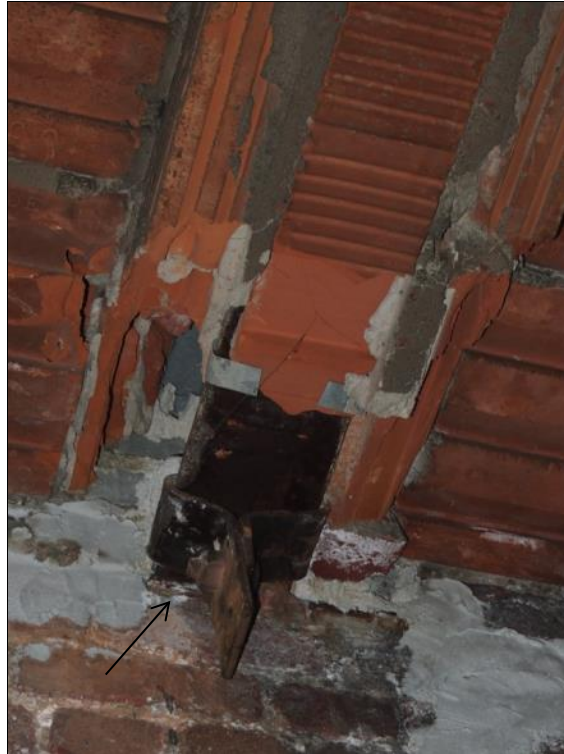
Typical clamp supporting the ceiling hanger rod, connecting to the bottom flange of the steel beam
